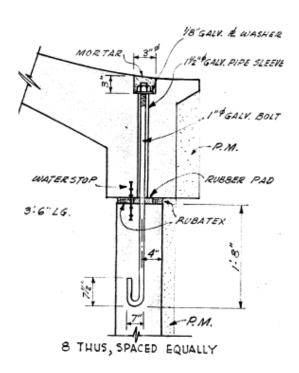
Dome Anchor Detail (Source Drawings: "North Valley 4.0 MG West Reservoir (A600001)")
